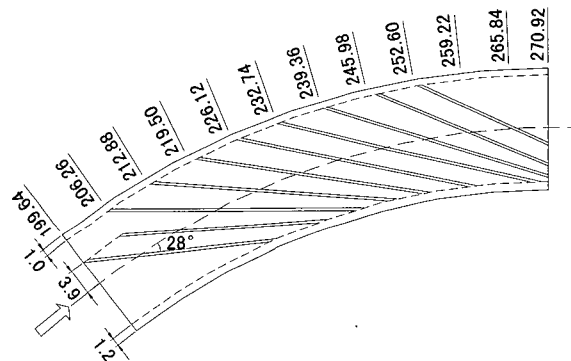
Layout of skew sills in the second curved conduit (unit: m)
